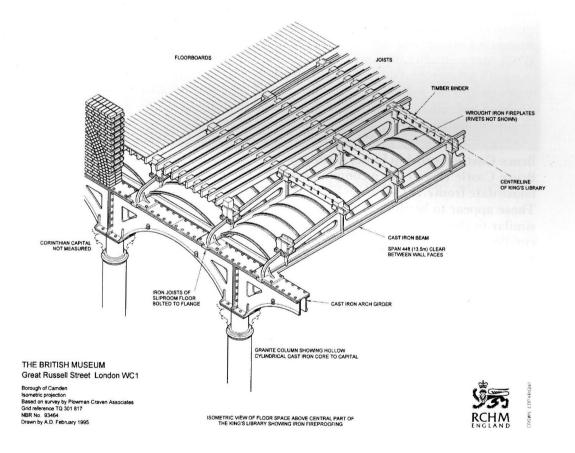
Floor above the King's Library, The British Museum, Great Russell Street, Camden, London RCHME Crown Copyright
